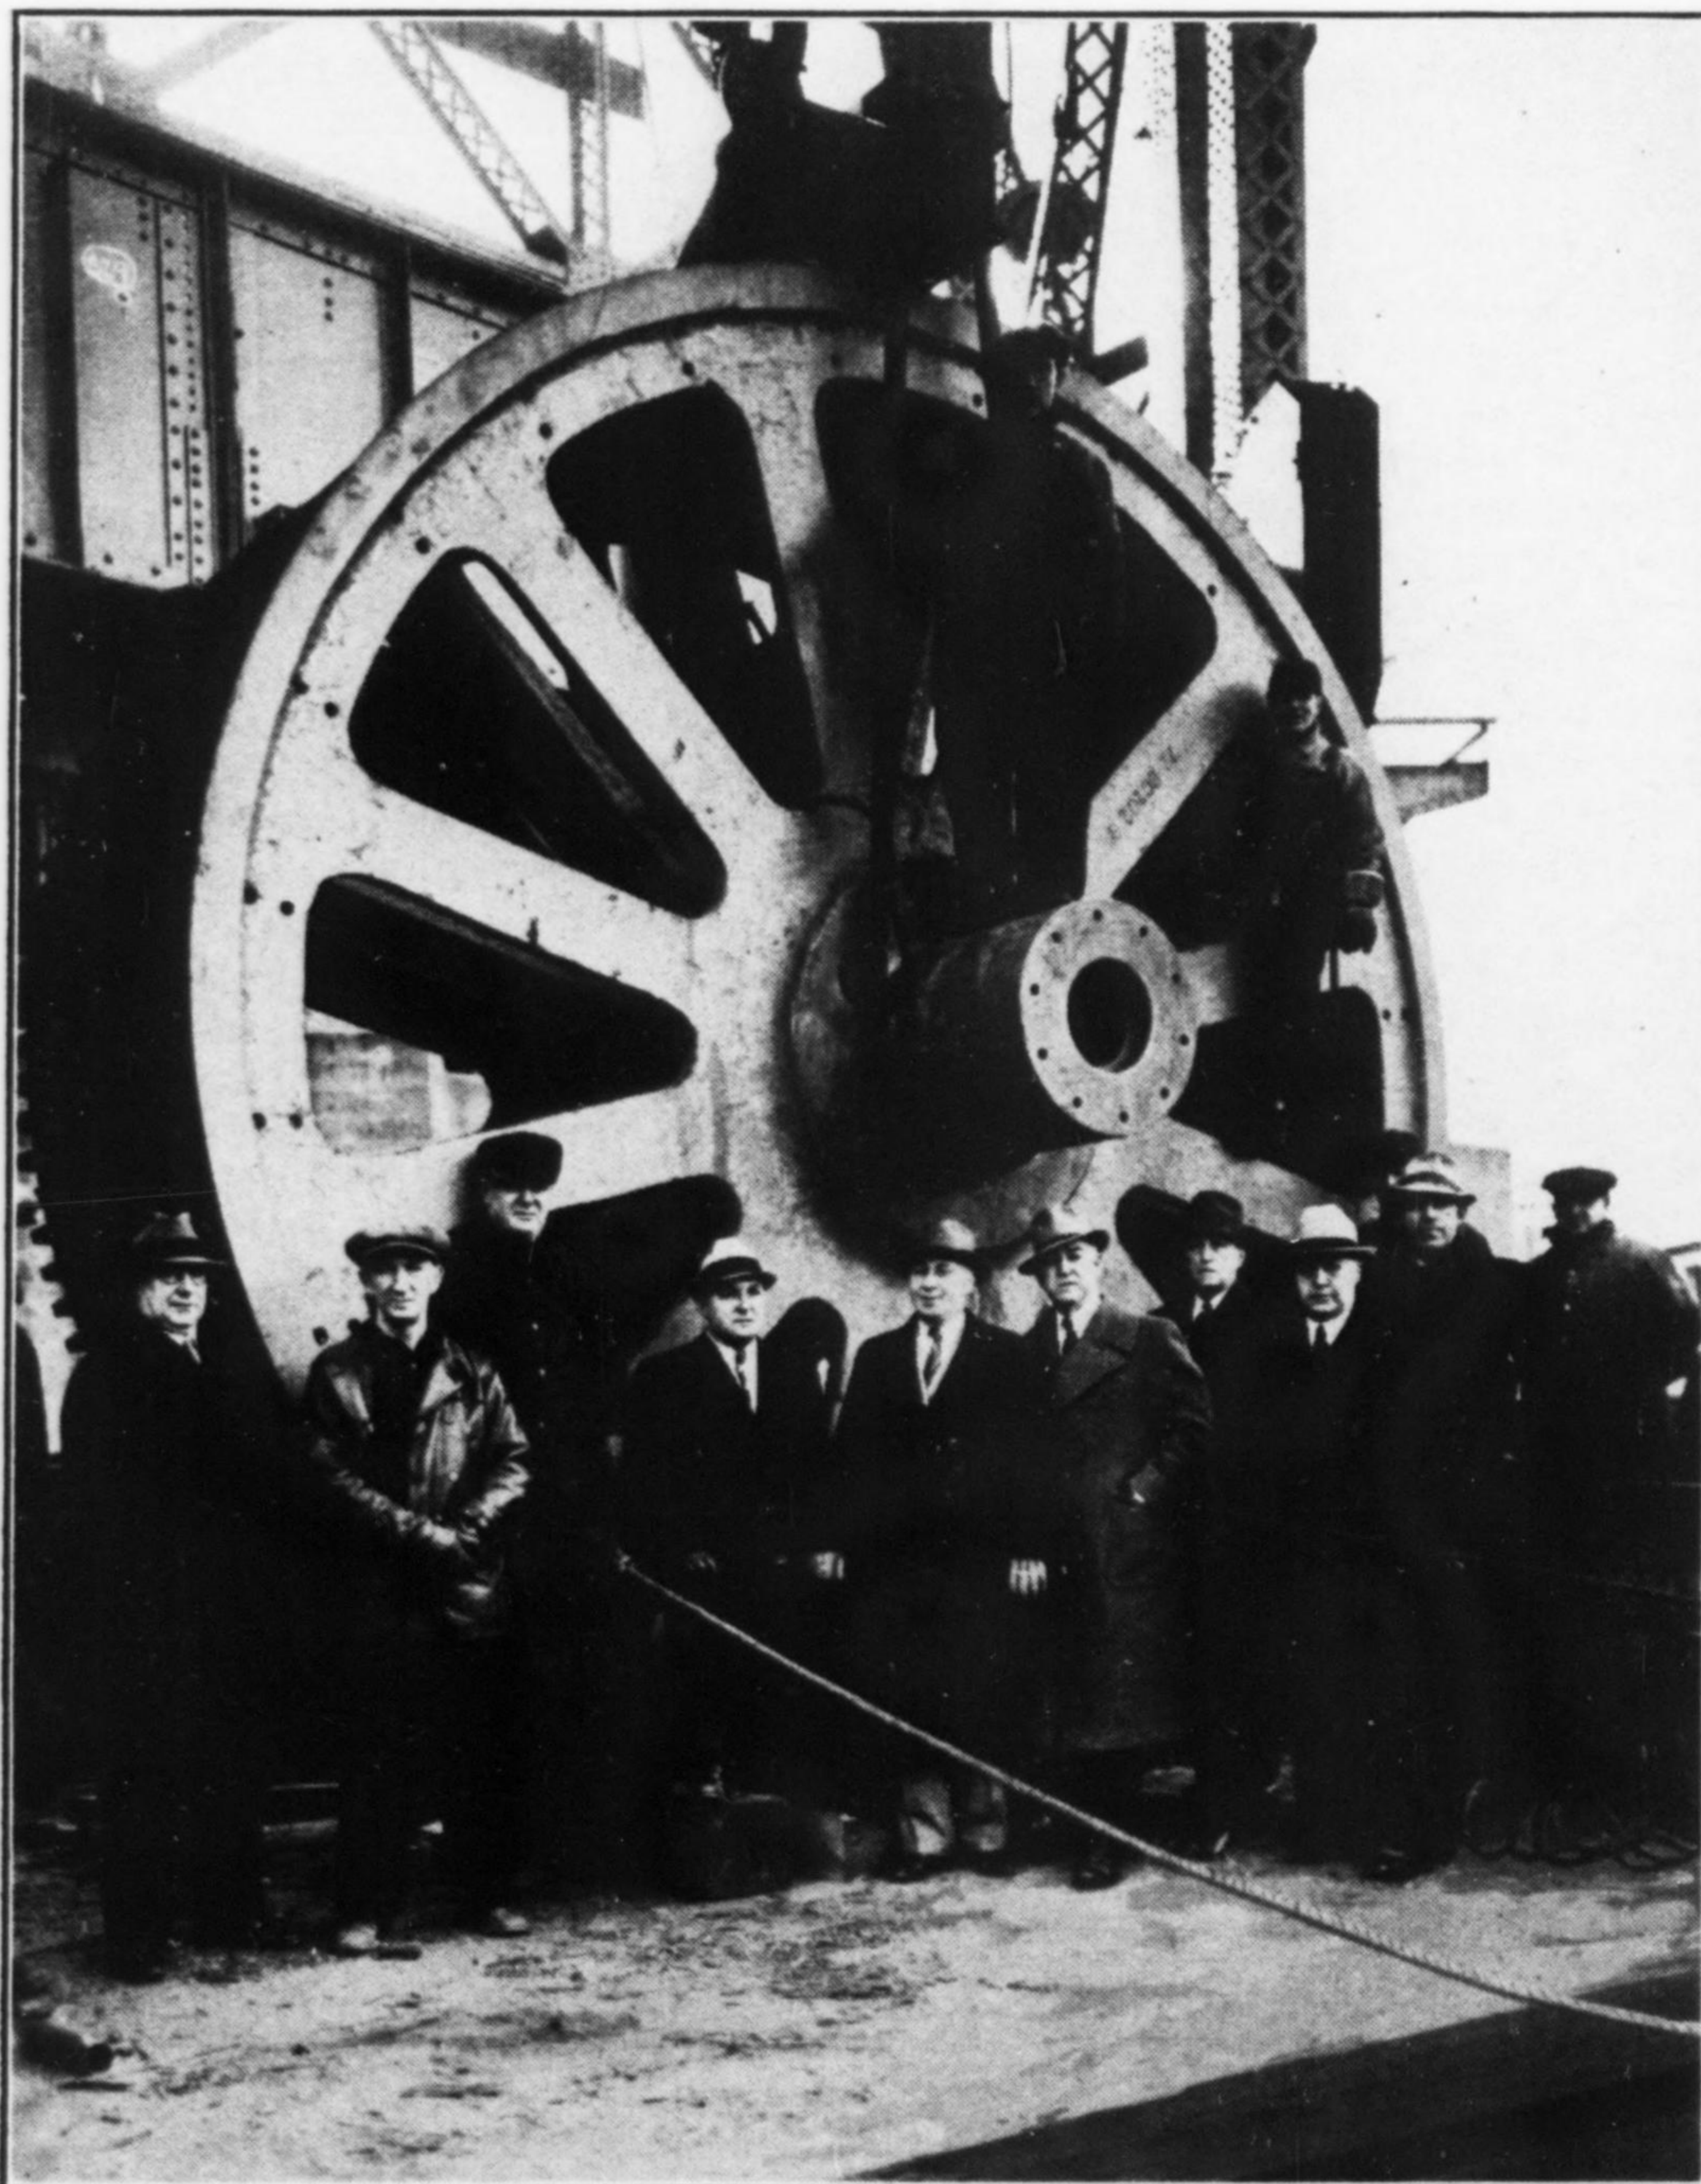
READY TO RAISE the last sheave using a saddle consisting of stirrups around the shaft connecting to a lifting beam.
